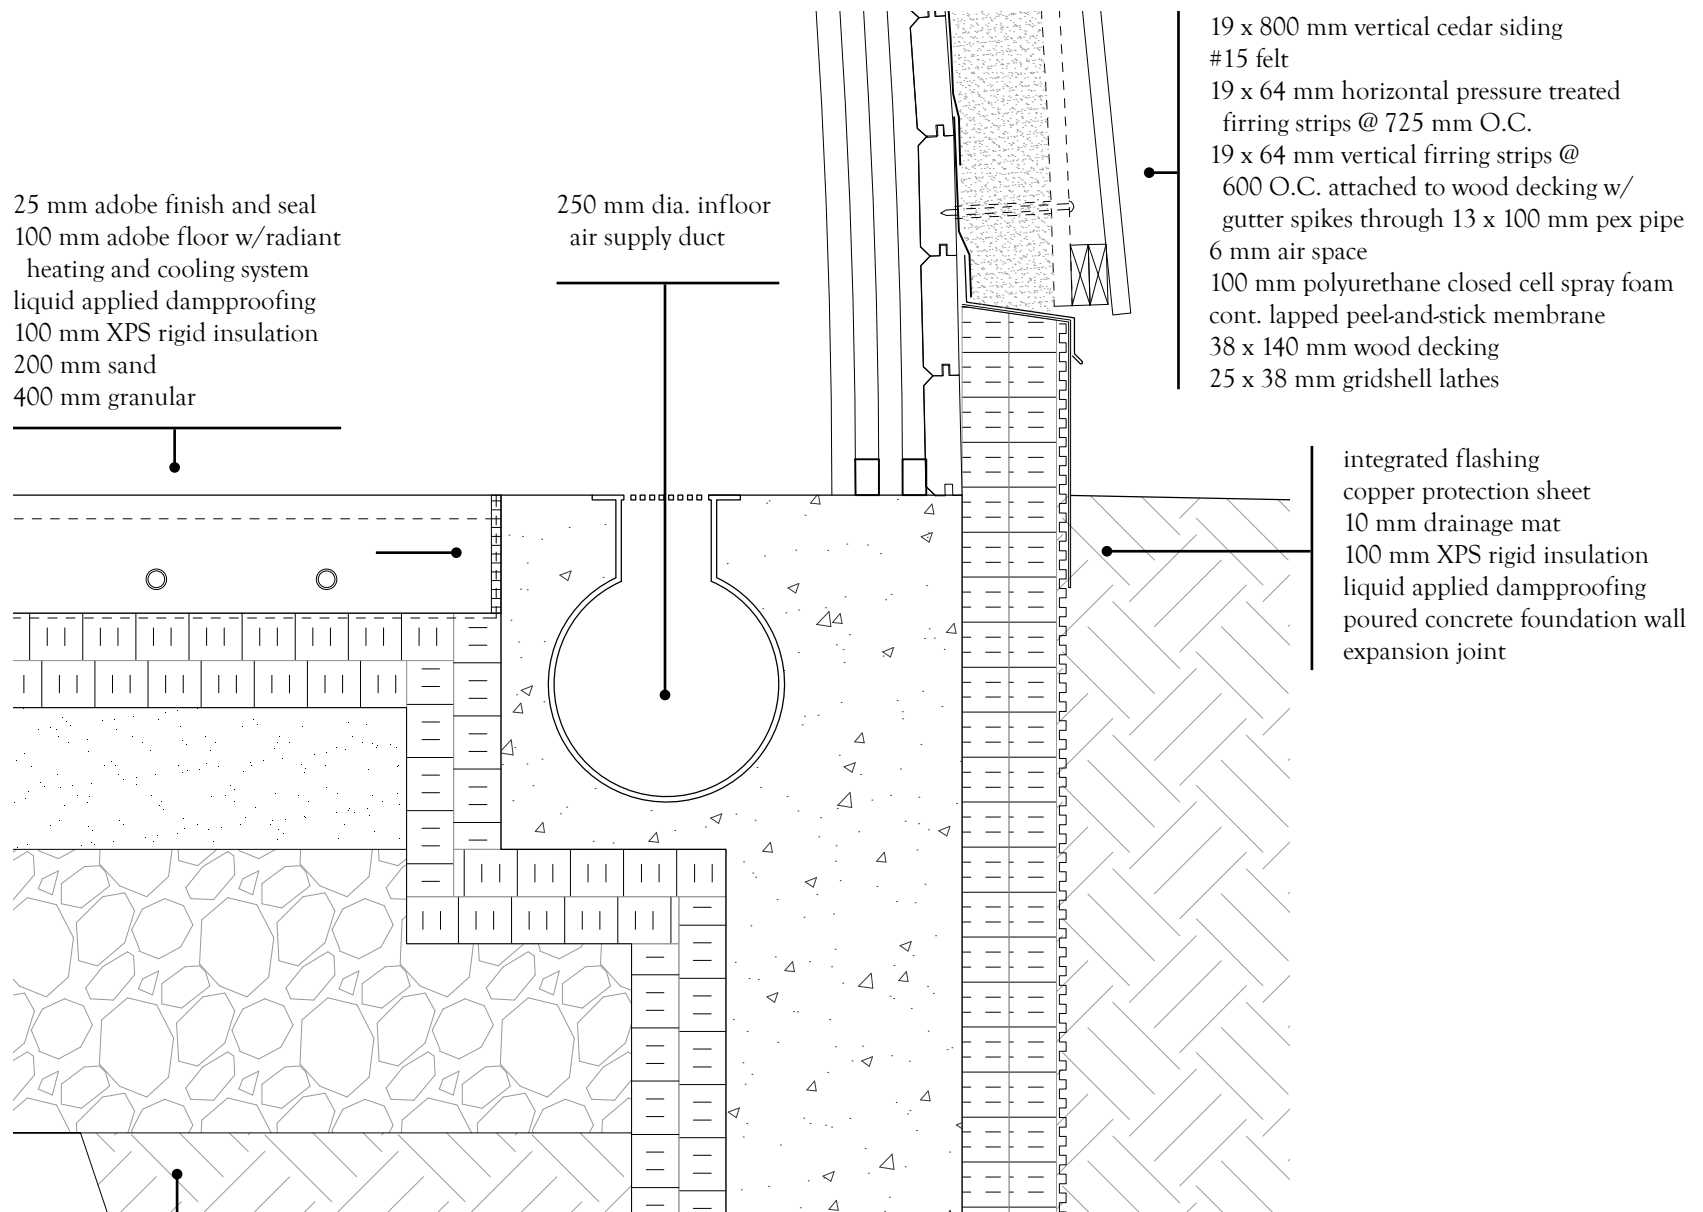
Detail G - Grid shell wall to slab + footing
